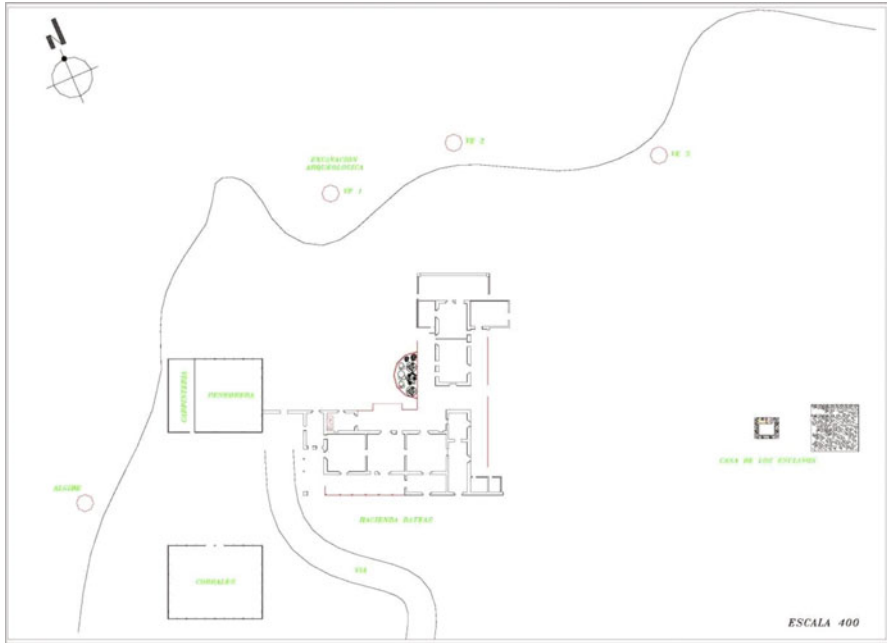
Hacienda Bateas plan. a Jesuit houses plant. b Slaves house. c Stoned house slaves. d Manger. e Carpentry. f Farmyards. g Cistern. h Garbage dump (EU-1). i EU-2. j EU-3 drafting of the plans: Architect Julieth Rojas Villalba. EU, excavation unit. (Taken by Suaza 2007, p. 183)
